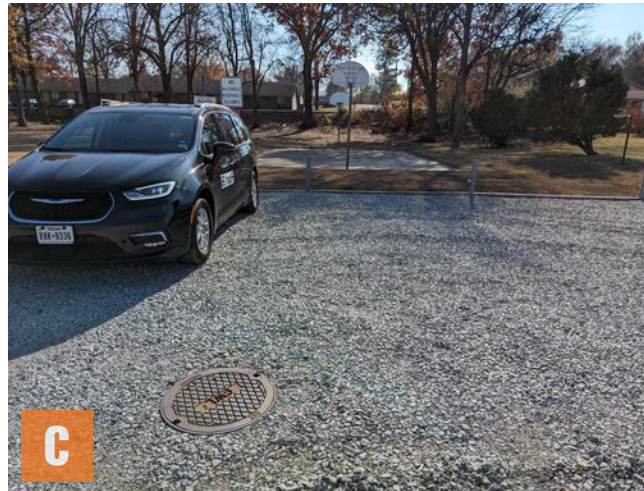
Image C. The parking lot at Stallings Park (big) without ADA accessible parking.
